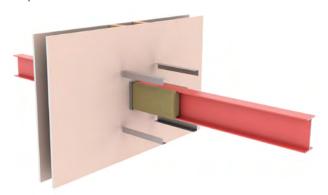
Example of construction steps for UB penetrating two-way FRR timber frame wall
